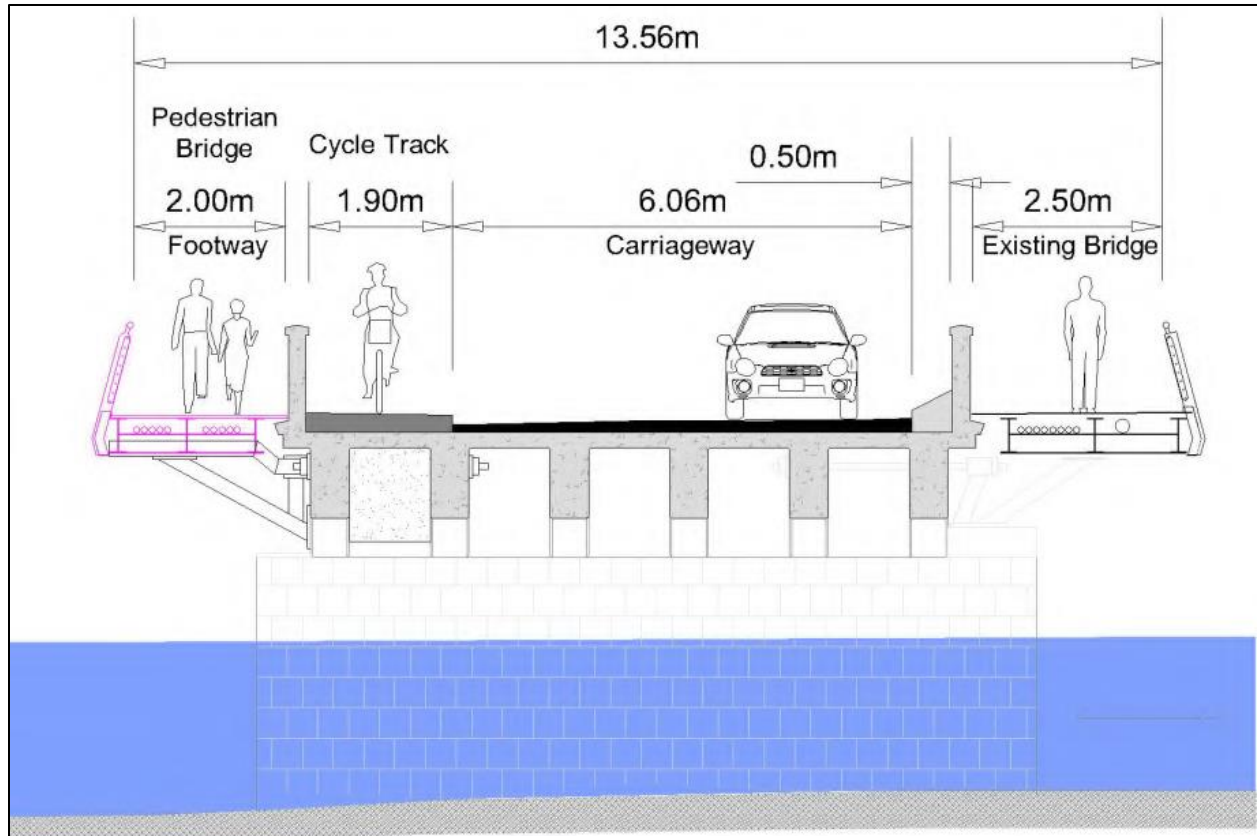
Wolfe Tone Bridge Proposed Cross Section (Facing West)³
